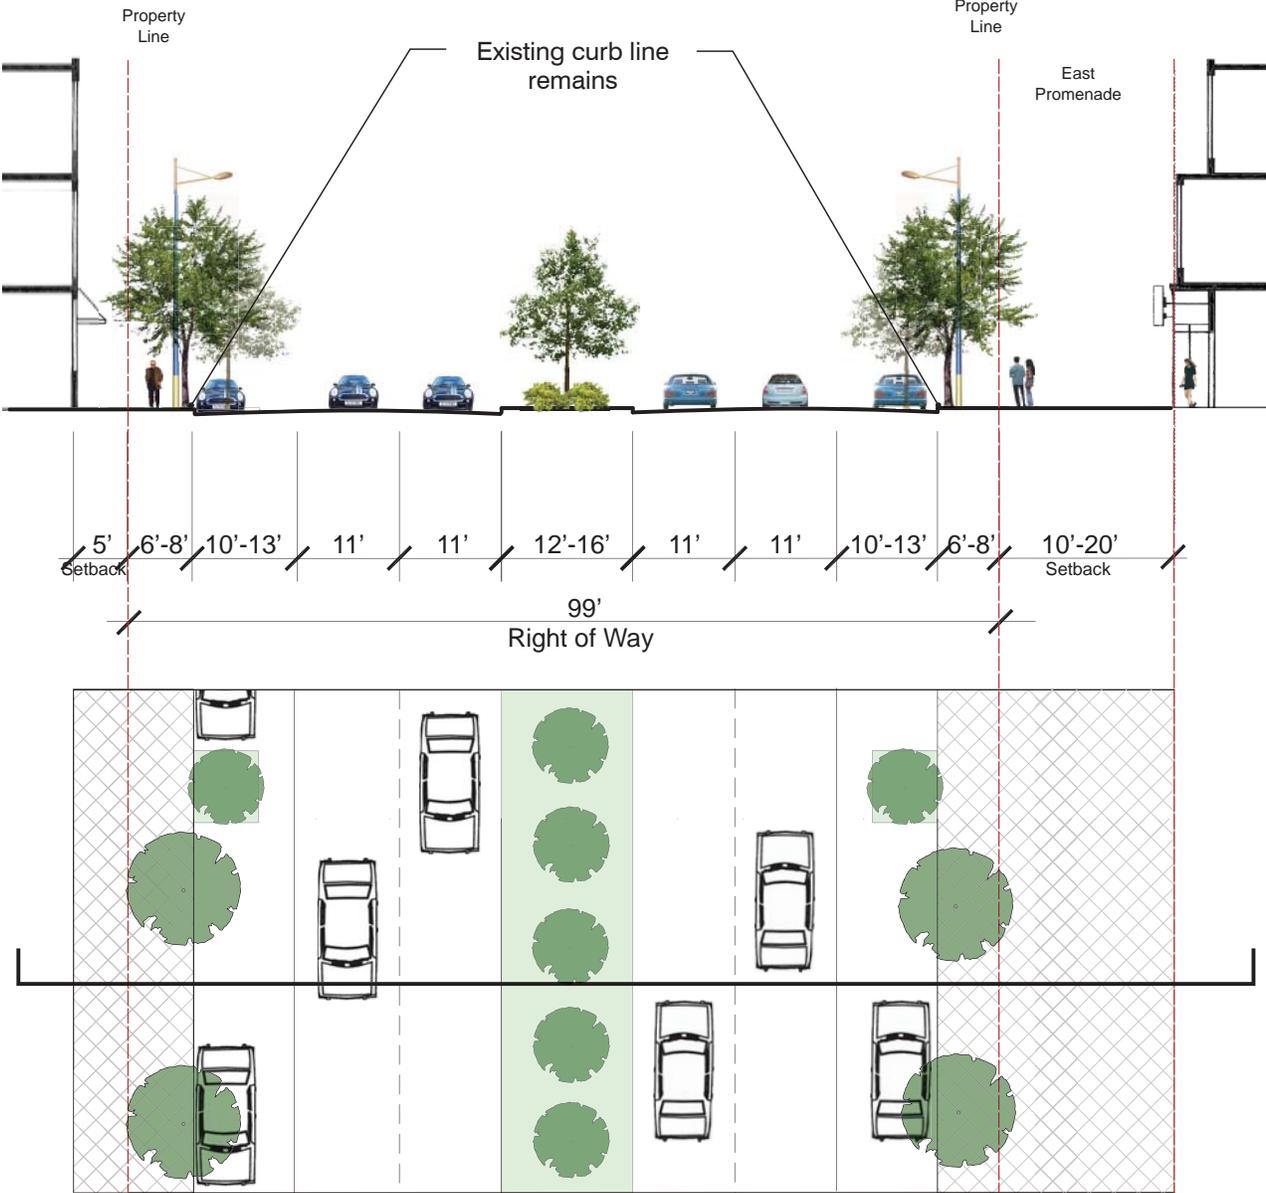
Typical section/plan at El Camino Real North between Valparaiso Avenue and Oak Grove Avenue
